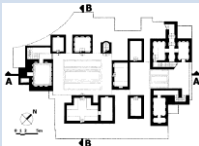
Basement Floor Plan (Sardab) of Gerami House (Ganjnameh, 2004)
